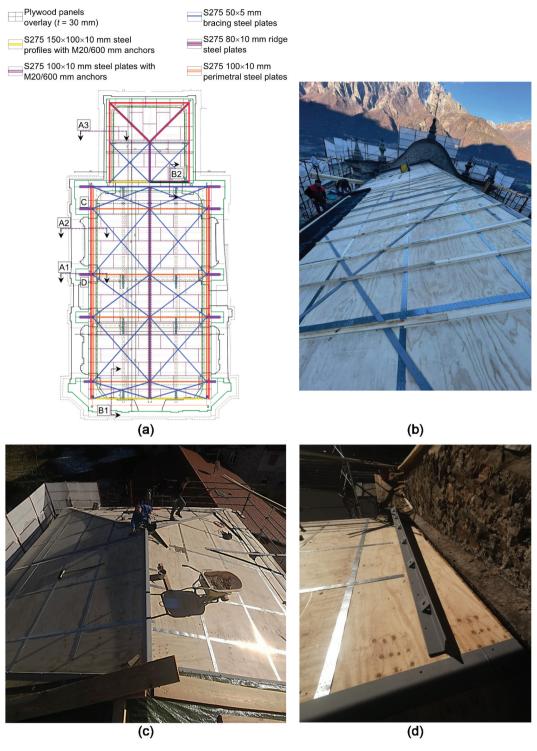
(a) Overview of the seismic retrofitting interventions; plywood panels overlay above the nave (b) and the apse (c); steel profile for the connection to masonry (d).
